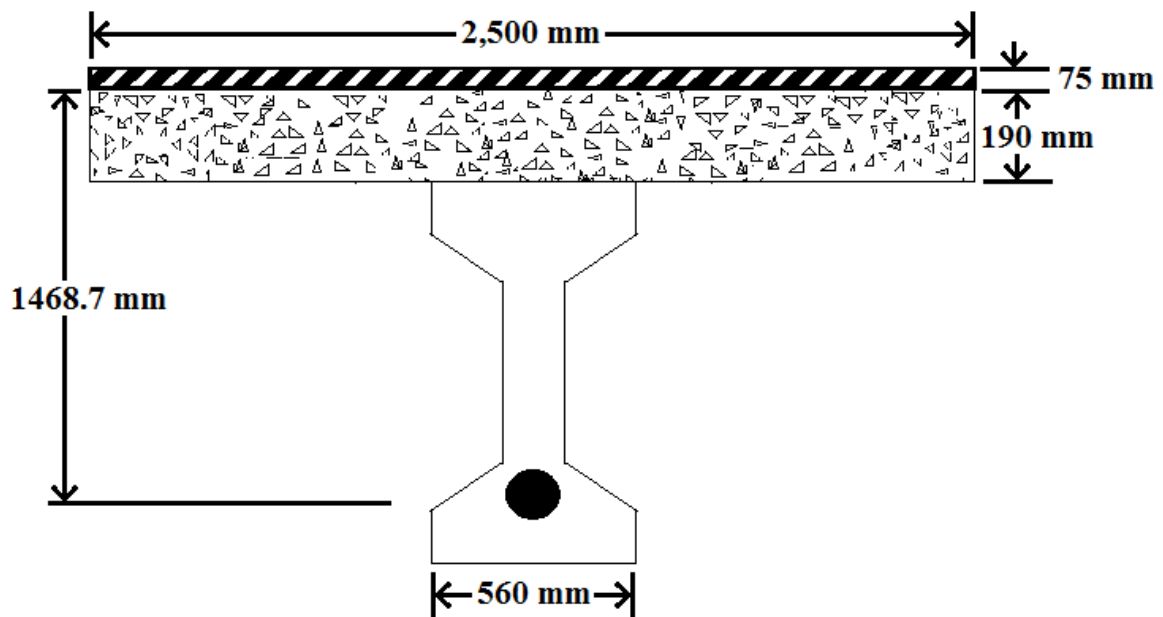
Cross section of interior girder at mid-span 25 m CPCI girder (x5)
